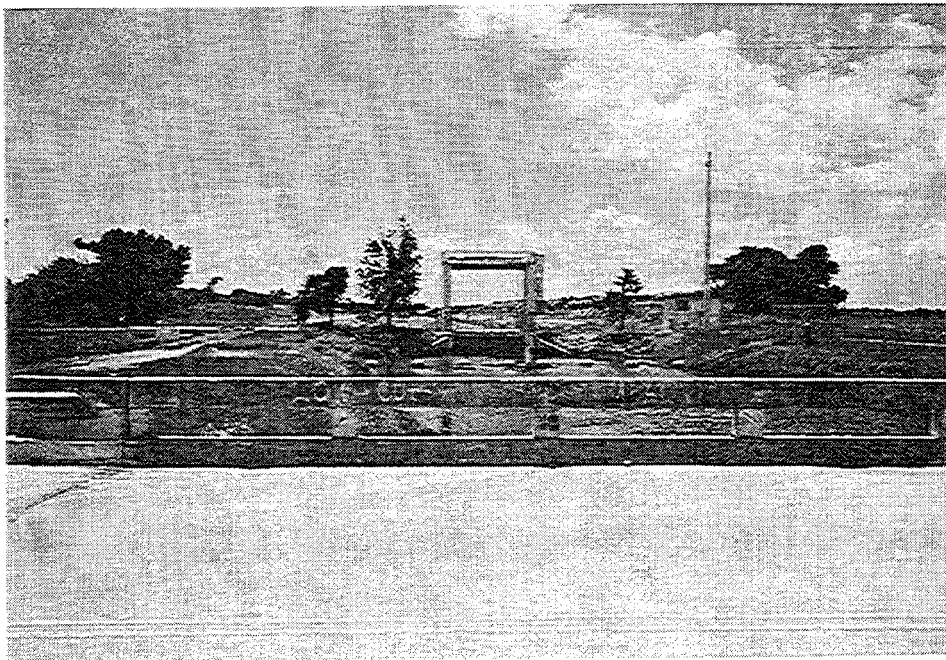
LOOKING DOWNSTREAM AT S-177, ON C-111.
